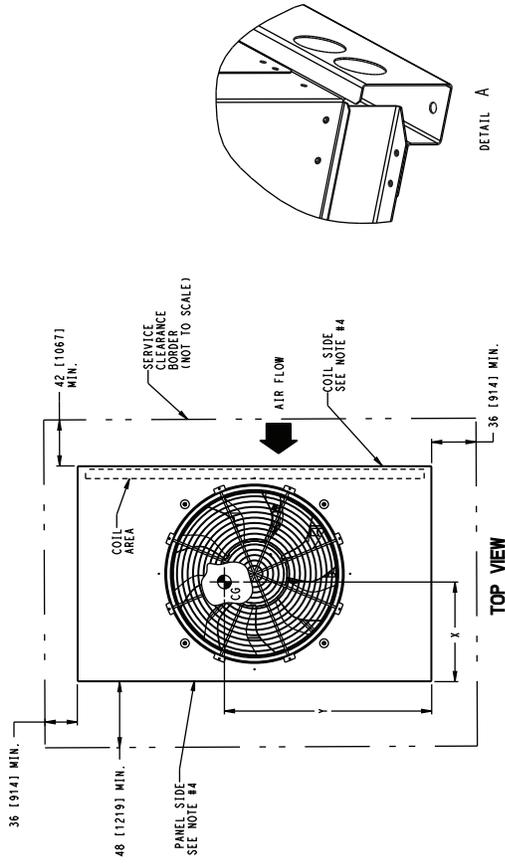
Dimensions — 30RAP010 and 015 Units
